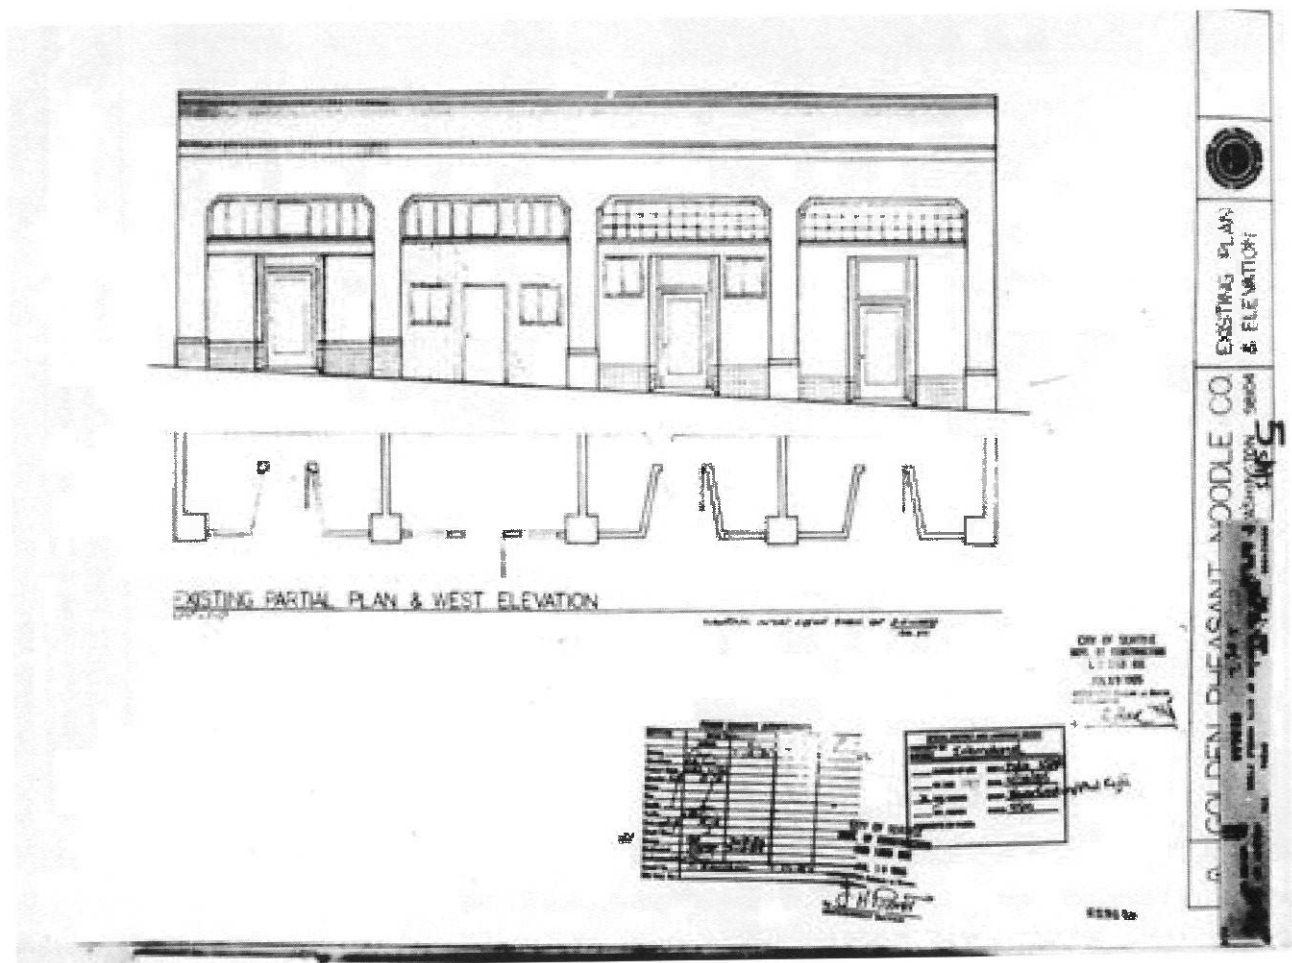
Existing Plan & Elevation - Historic Microfilm Drawings - 206 5th Avenue S - 1985 Renovation
